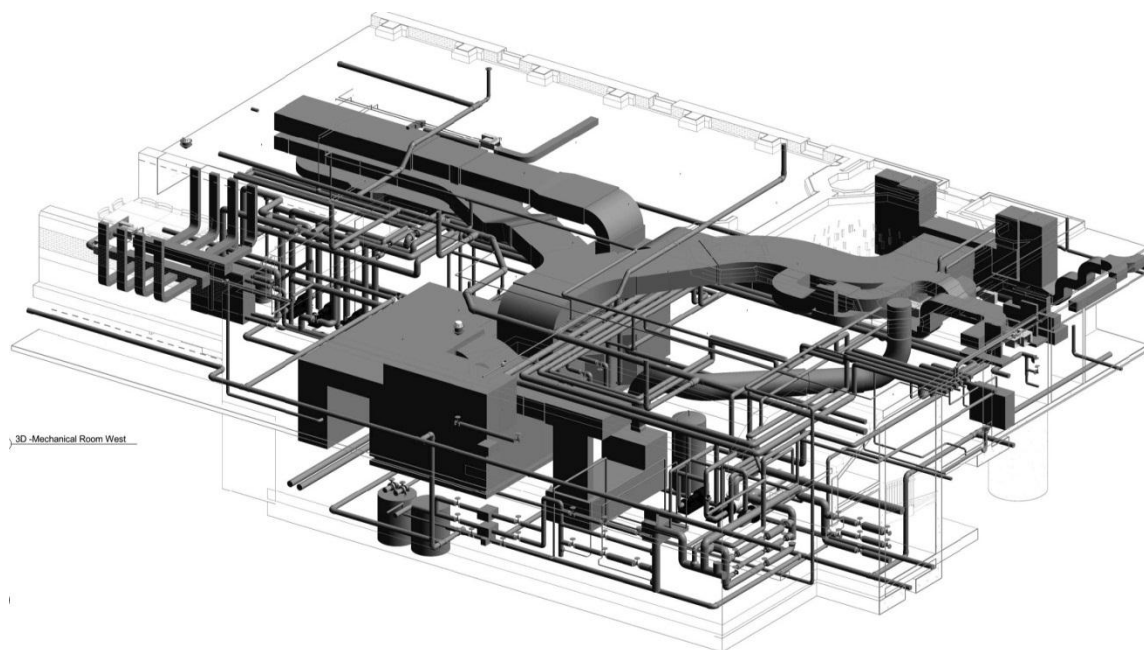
Plan of Mechanical Room (Plan-Issued for Construction, 2012)
